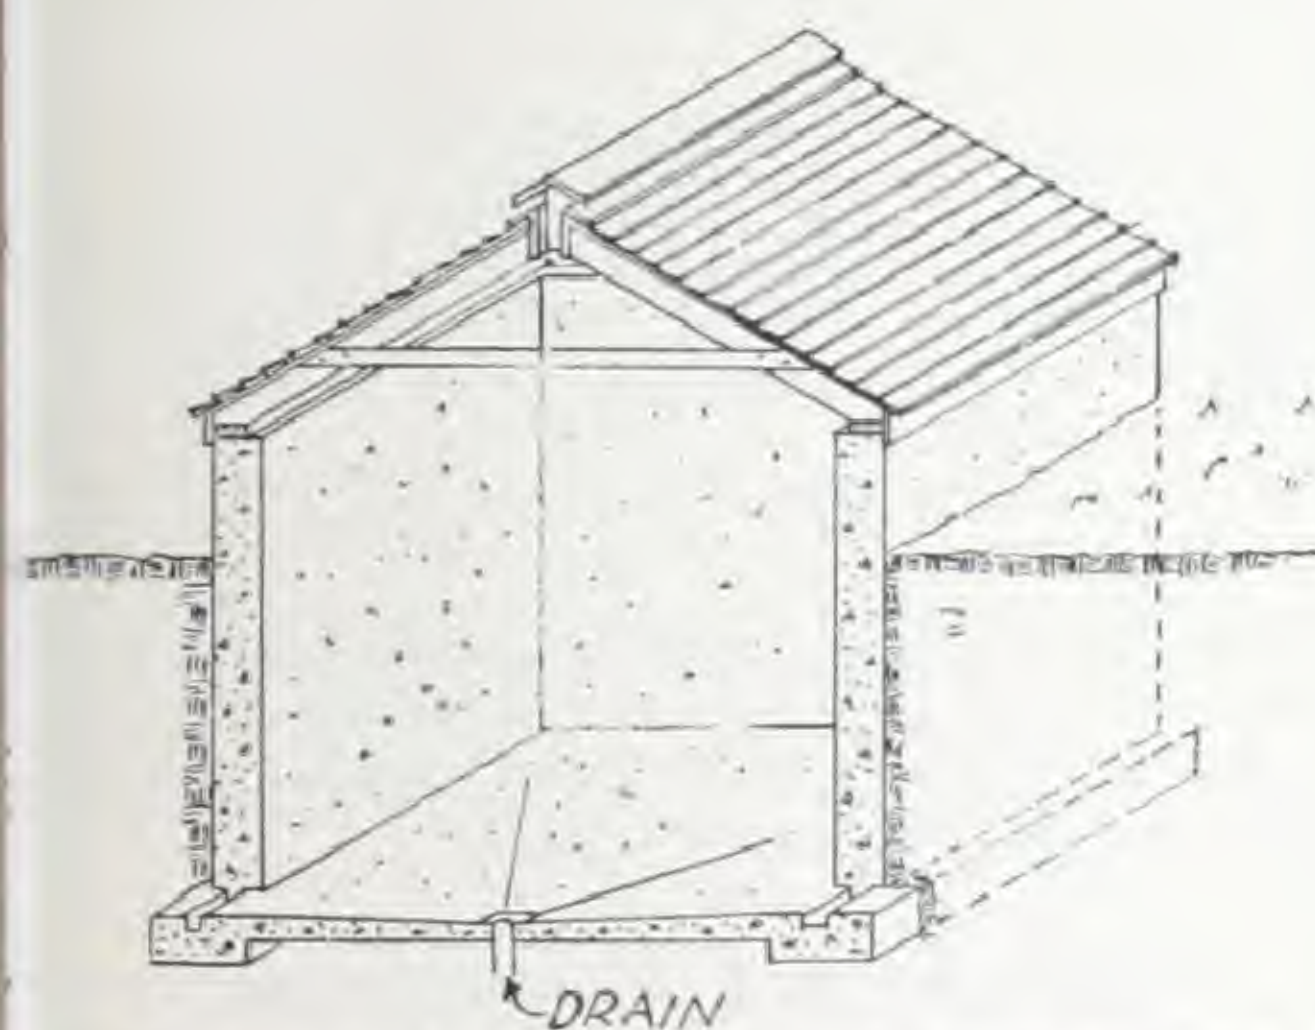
Detail of a section of root cellar or small ice house with wooden roof.
